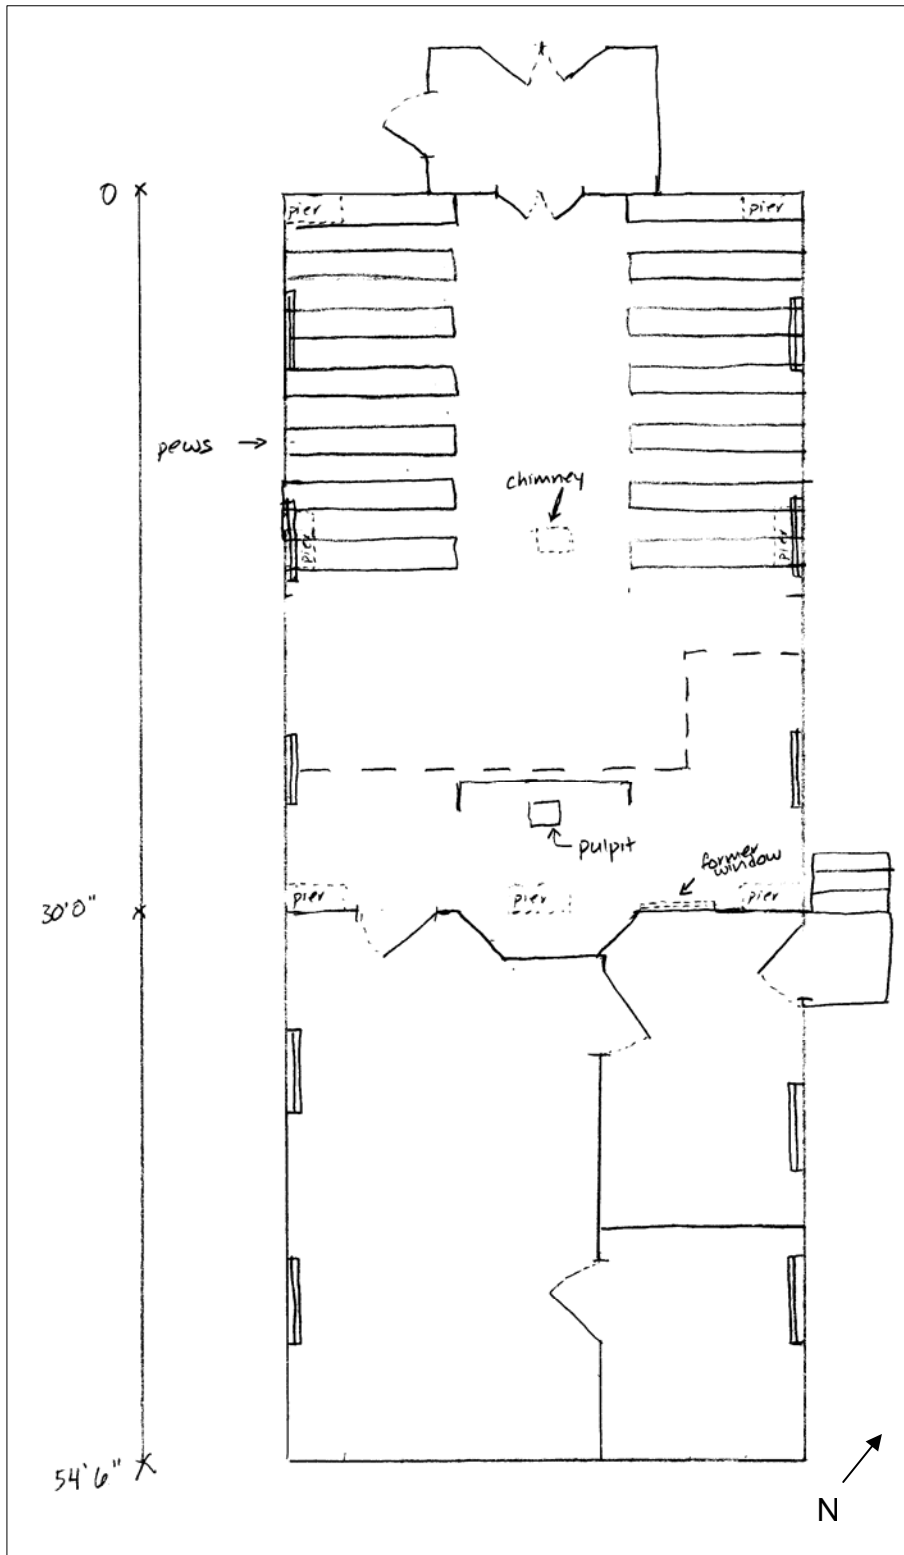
Floor plan (not to scale) of Orrick Chapel (History Matters, 2005).
